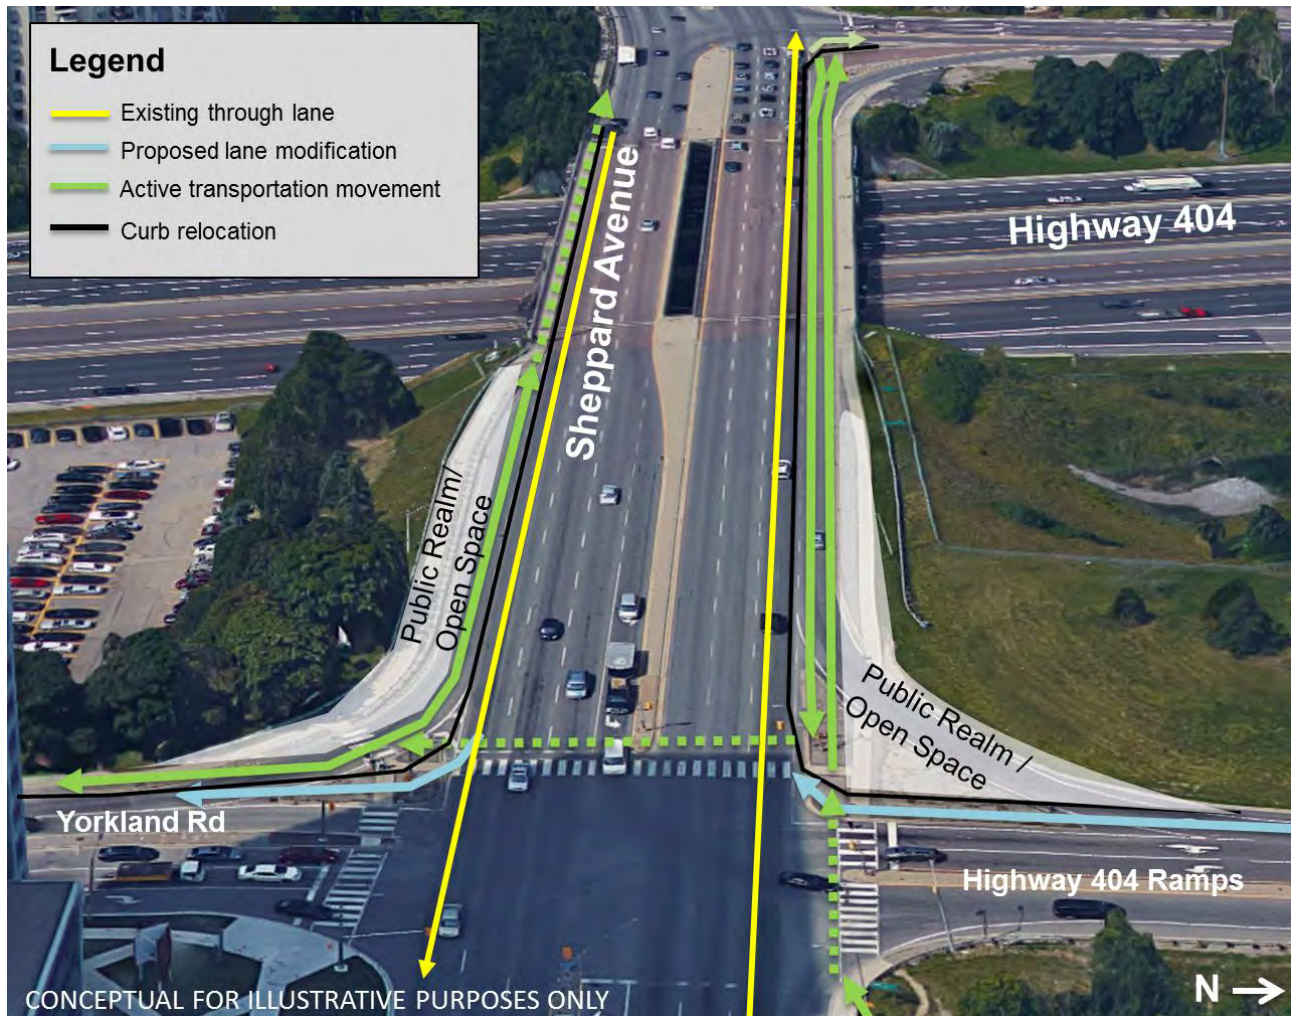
Conceptual proposed improvement to Sheppard Avenue East over Highway 404 – Plan View
